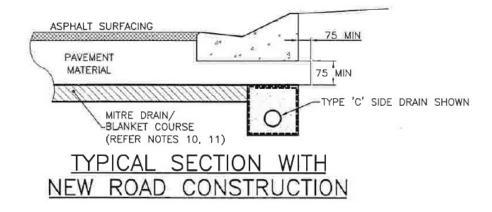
Urban Pavement Subsoil Drainage (Source: Brisbane City Council Standard Drawing UMS261, Revision B, March 2005)
